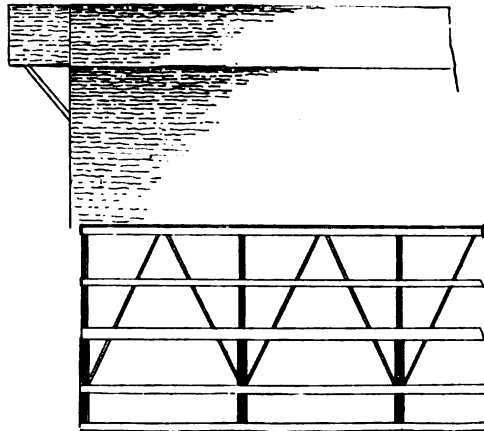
Elevation of a part of the side and roof of the Wing joist-frame barn construction.
